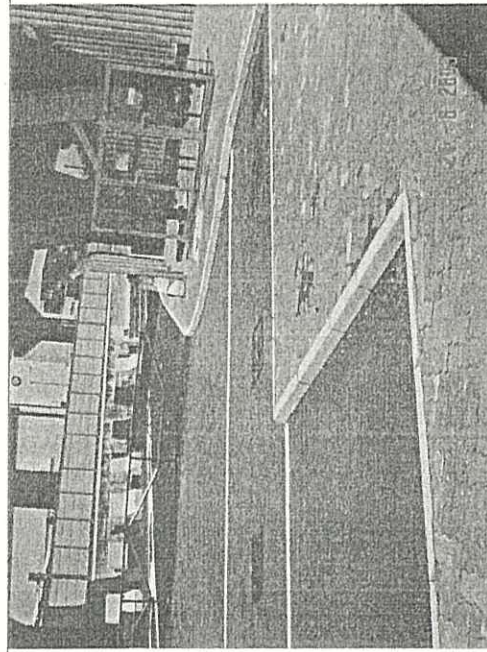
Oil interceptor for pump sump located in the tunnel section near Prince Edward Ventilation Building
